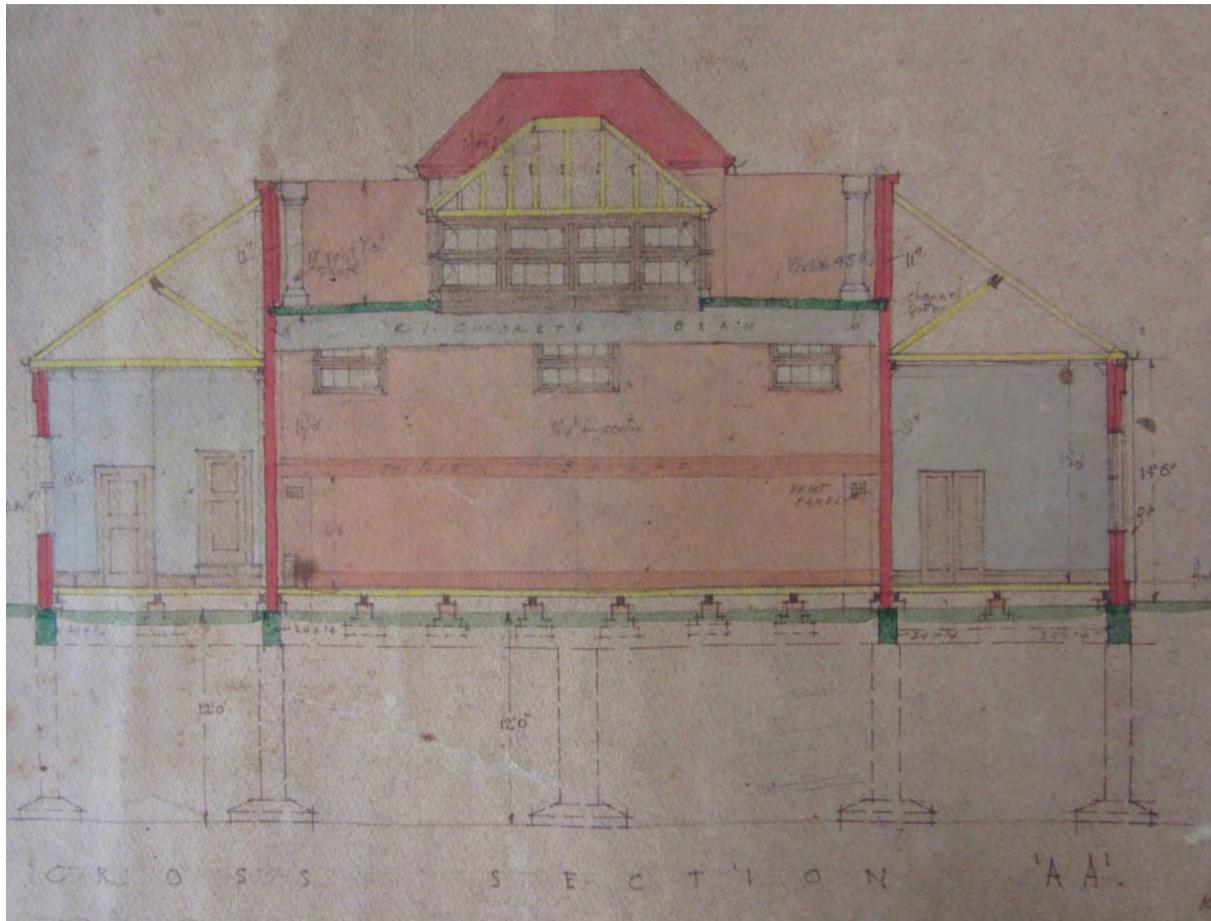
Cross Section of construction drawing showing the original position of the lantern and the stair to the rear - with the dark coloured roof. The pitched roof to the lantern was not built. A lower cost flat roof was built. The piles and piers are shown. Source: Waverley Council
